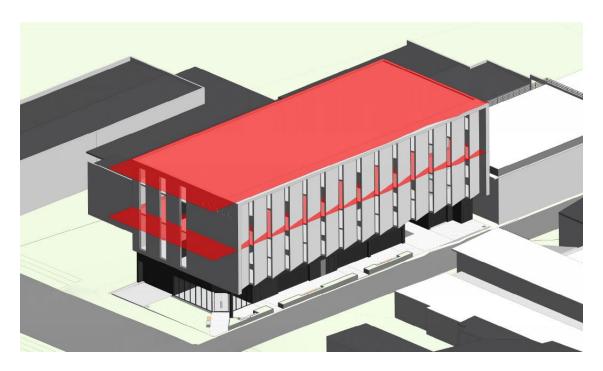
Building height breaching elements showing the 11m and 18m building height planes
